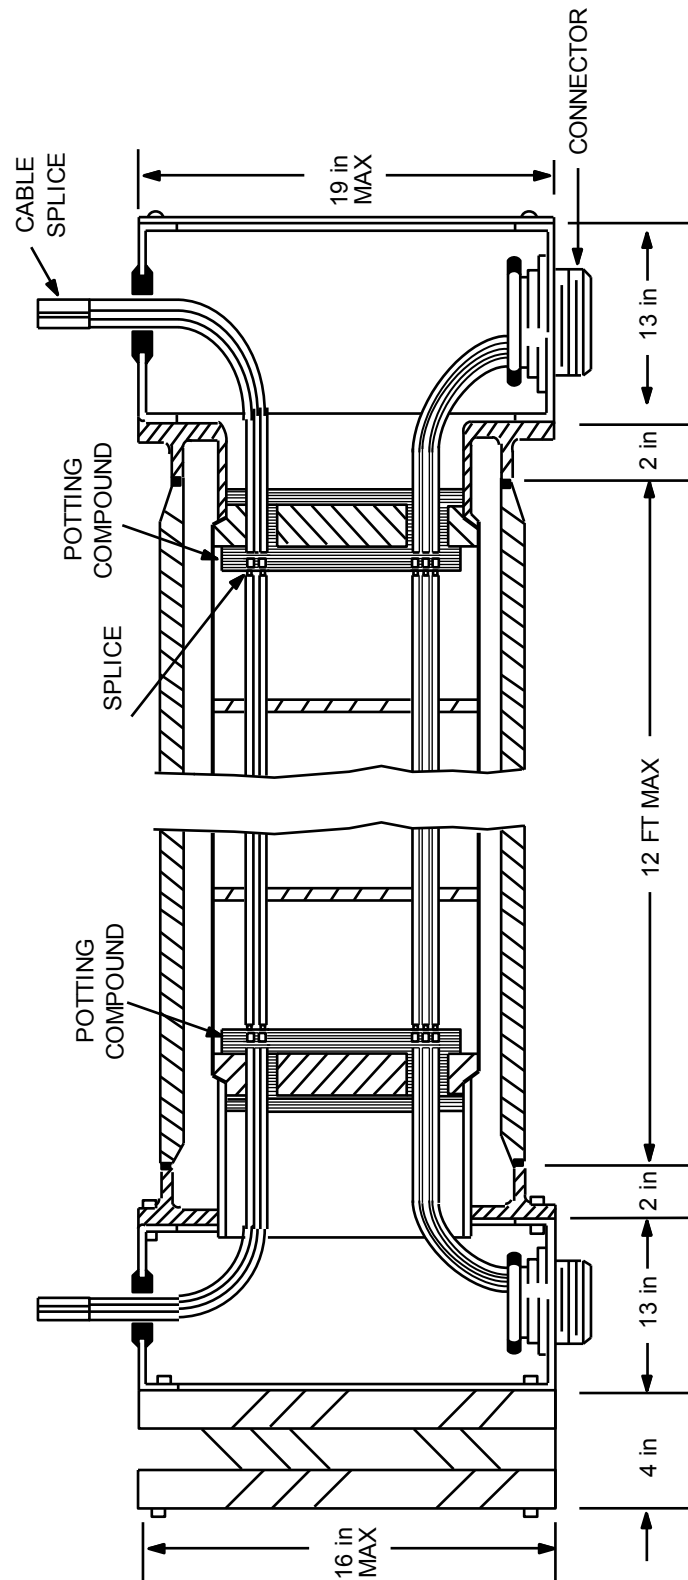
Center Section - Shielded Signal Cable Electrical Penetration Assembly
